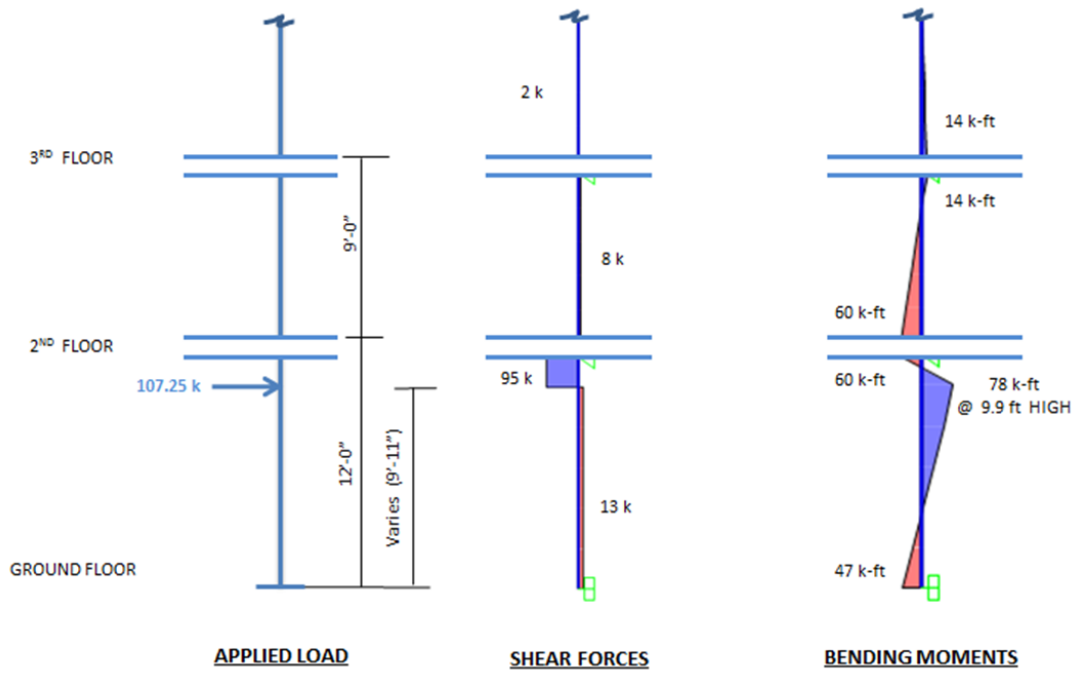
Impact load applied at "d" away from the end of column on the ground floor
